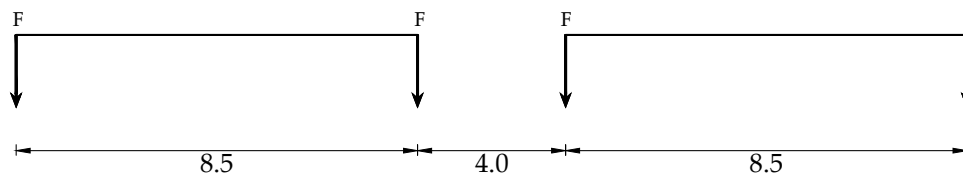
Train 1 dimensions and loads. Dimensions in m.
